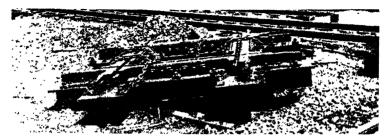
New Design of Steel Substructure and Crossing Assembled for Setting in Place.
